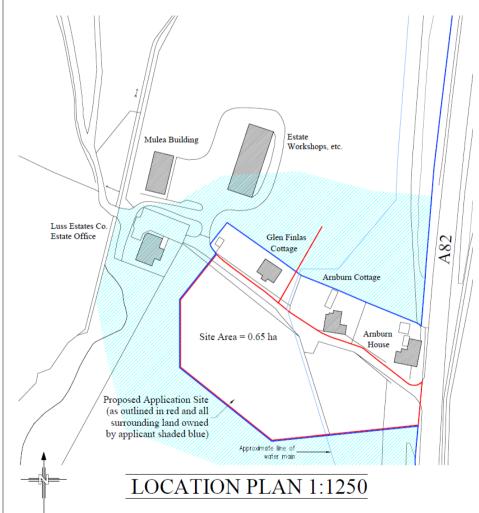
Extract of Location Plan Loc Rev B (not to scale)
